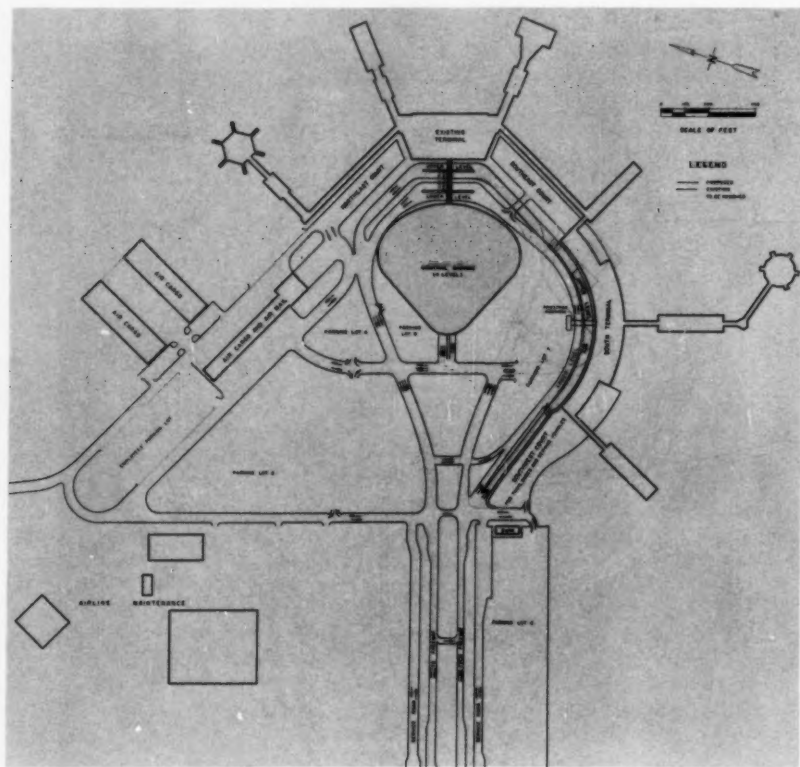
FIRST STAGE PLAN OF TERMINAL AREA
